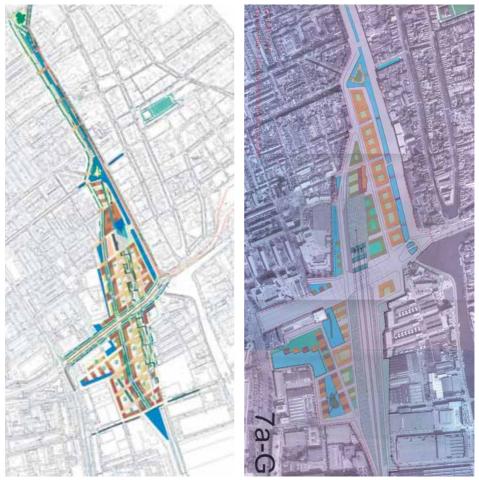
a. Masterplan of the long tunnel; b. short tunnel (Source: Busquets,2003).
